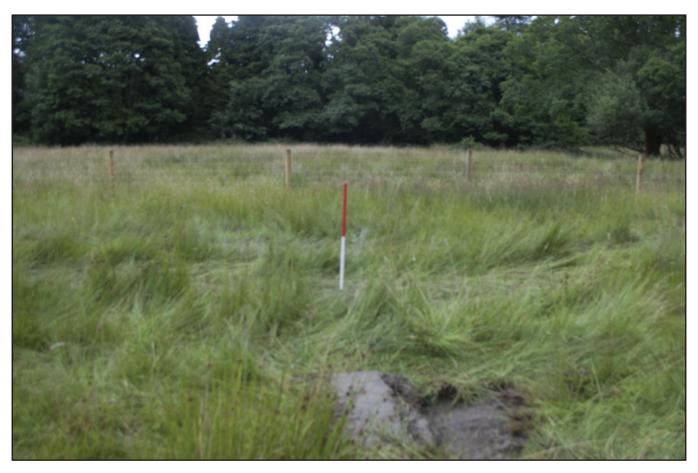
launch pit 2 - general location as viewed from the east (scale: 1.0m; archive image: G2528\_005).
